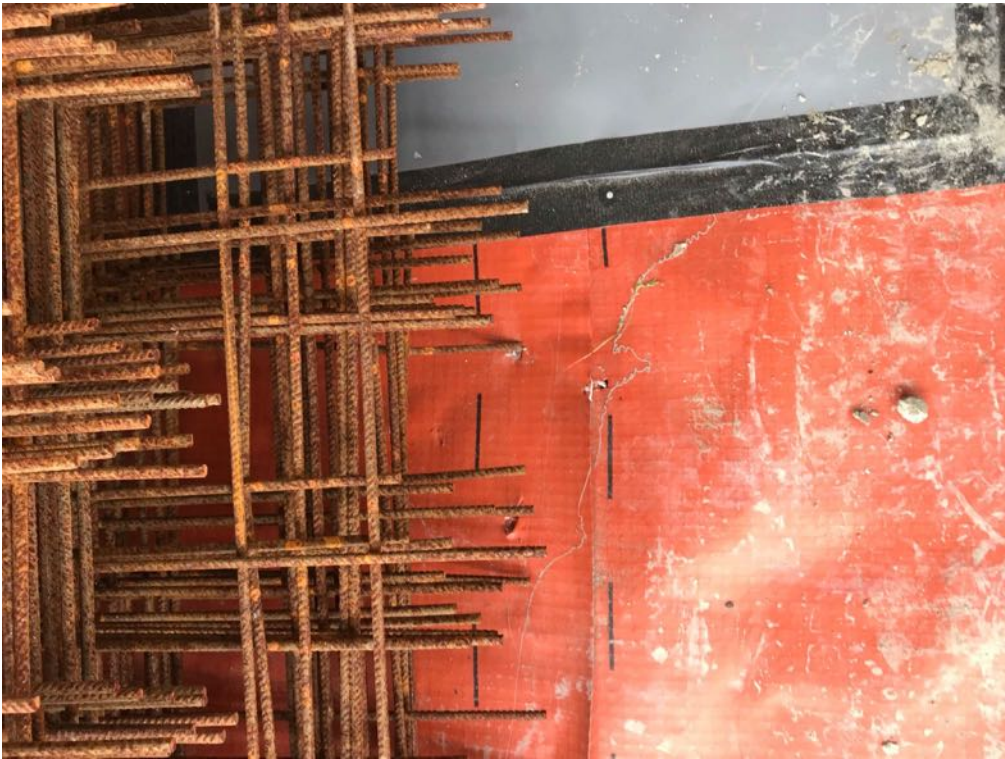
Localised damage to membrane from mesh reinforcement (26/08/2021)
